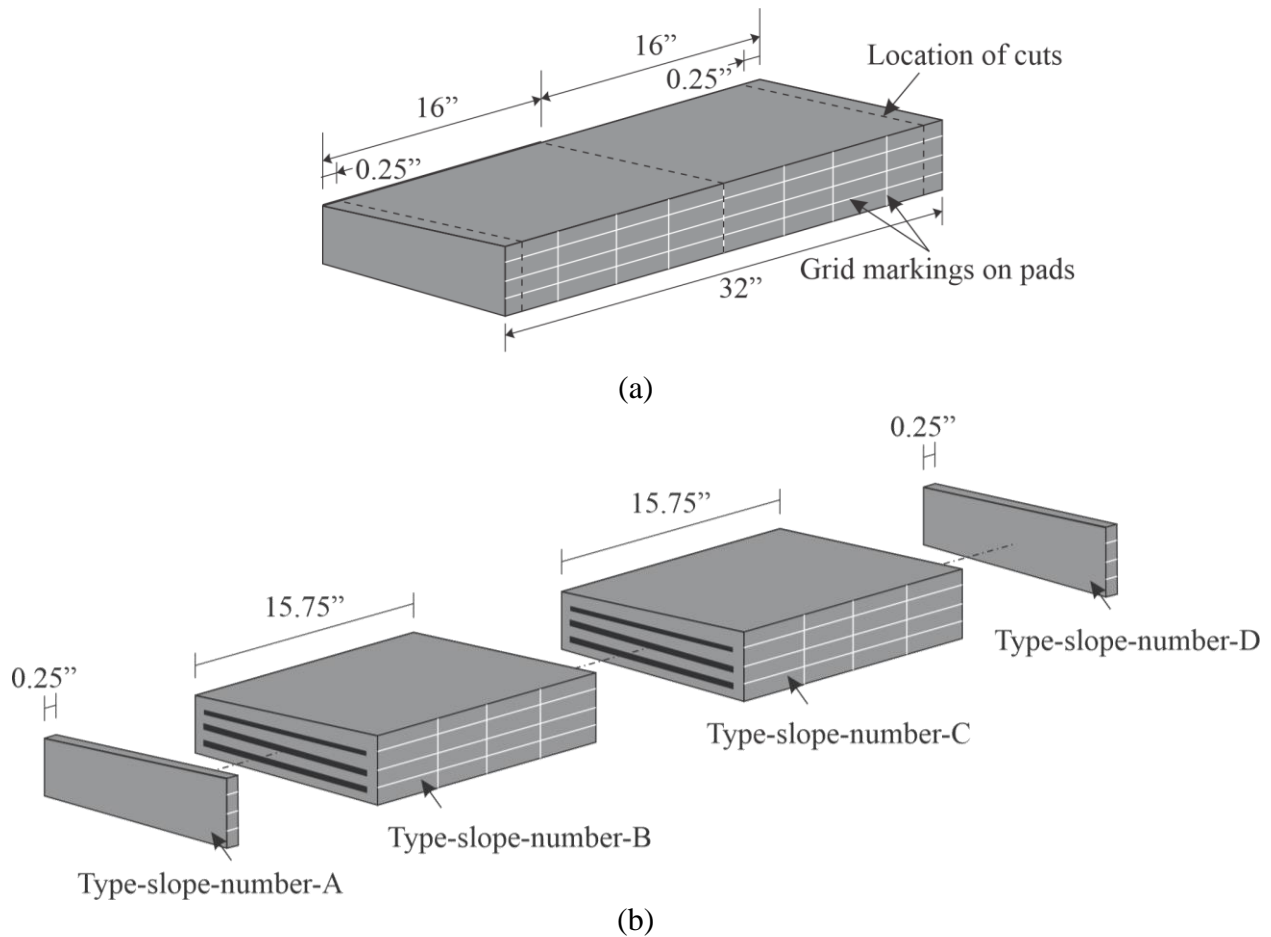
Bearing pad dissection schematic: (a) location of cuts; (b) dissected component labels
